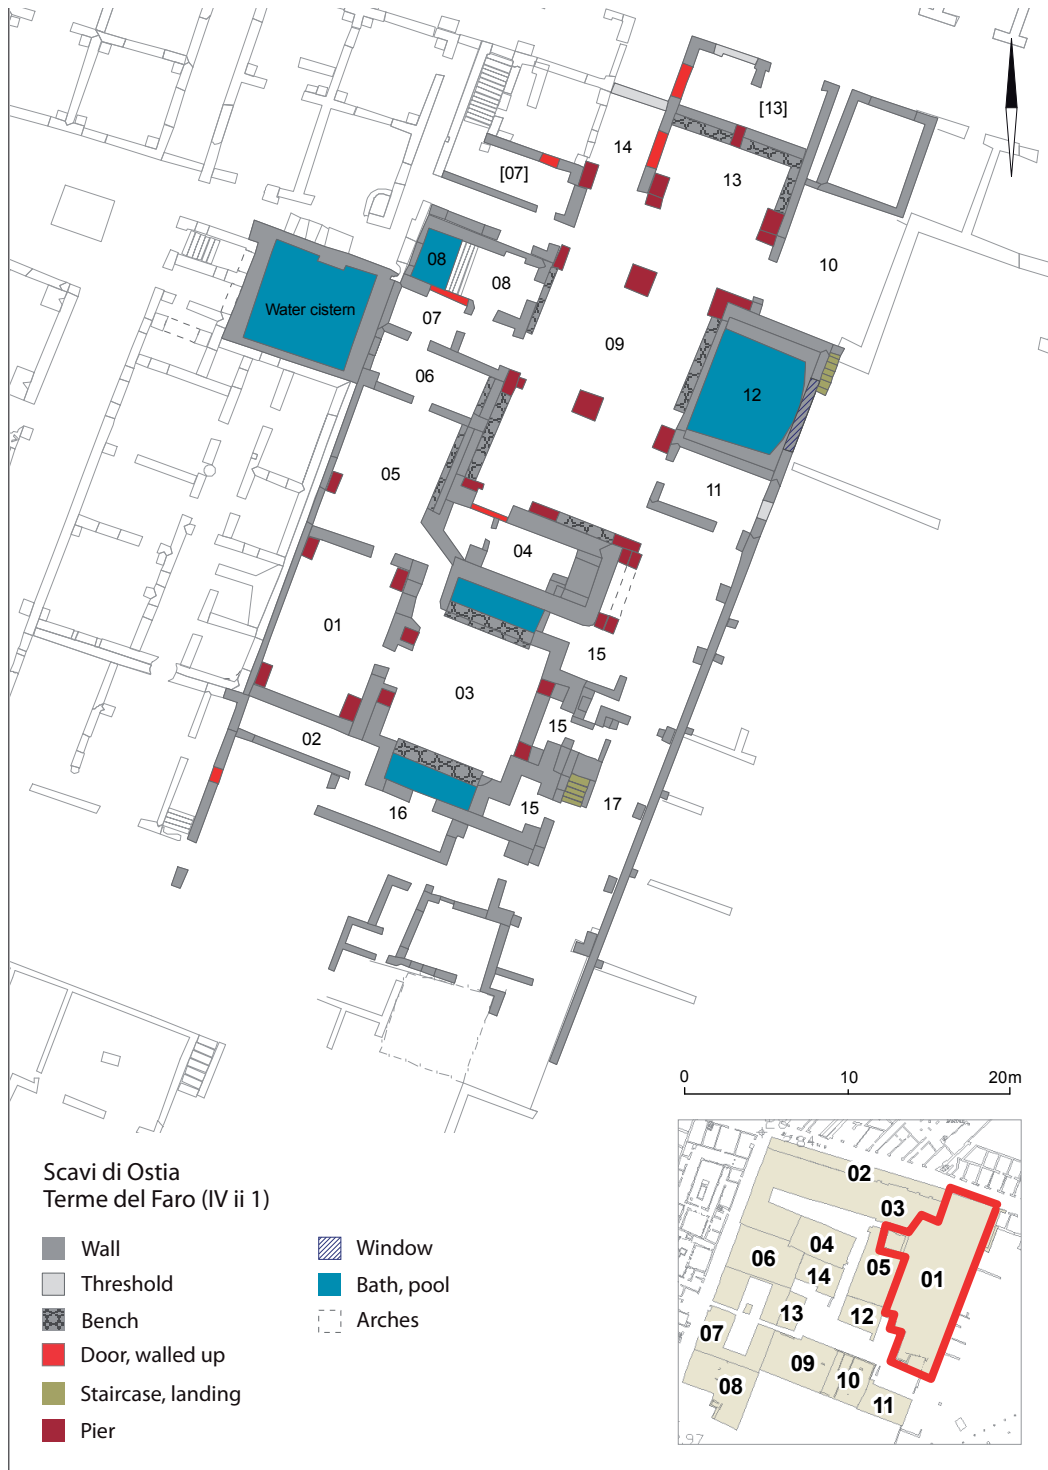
Terme del Faro (IV ii 1) walled structures and architectural details
